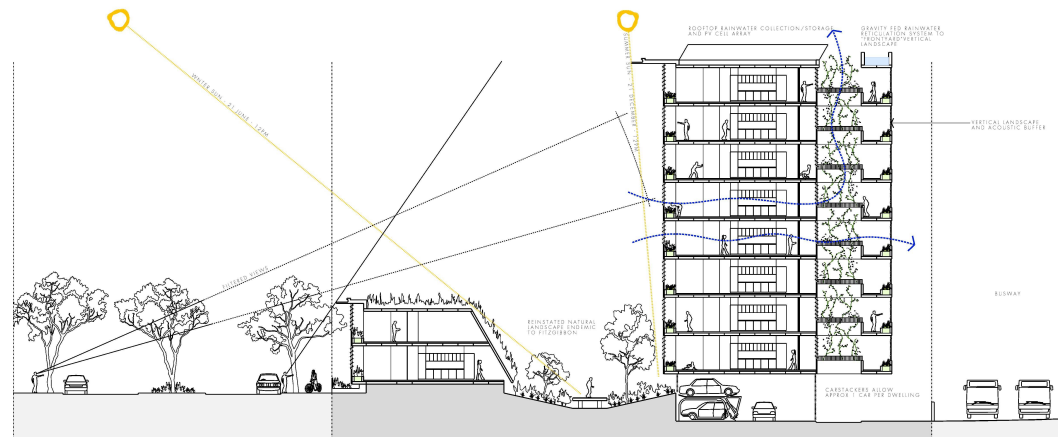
Gall and Medek, Airy Units Typical Elevation (Street View)
